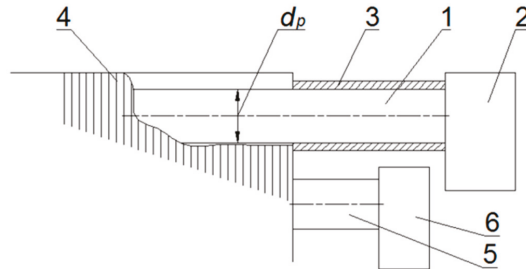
Innovative construction solution of starting cage: 1—starting cage bar, 2—end ring of starting cage, 3—sleeve, 4—core, 5—working cage bar, 6—end ring of working cage, d_p —diameter of starting bar.
